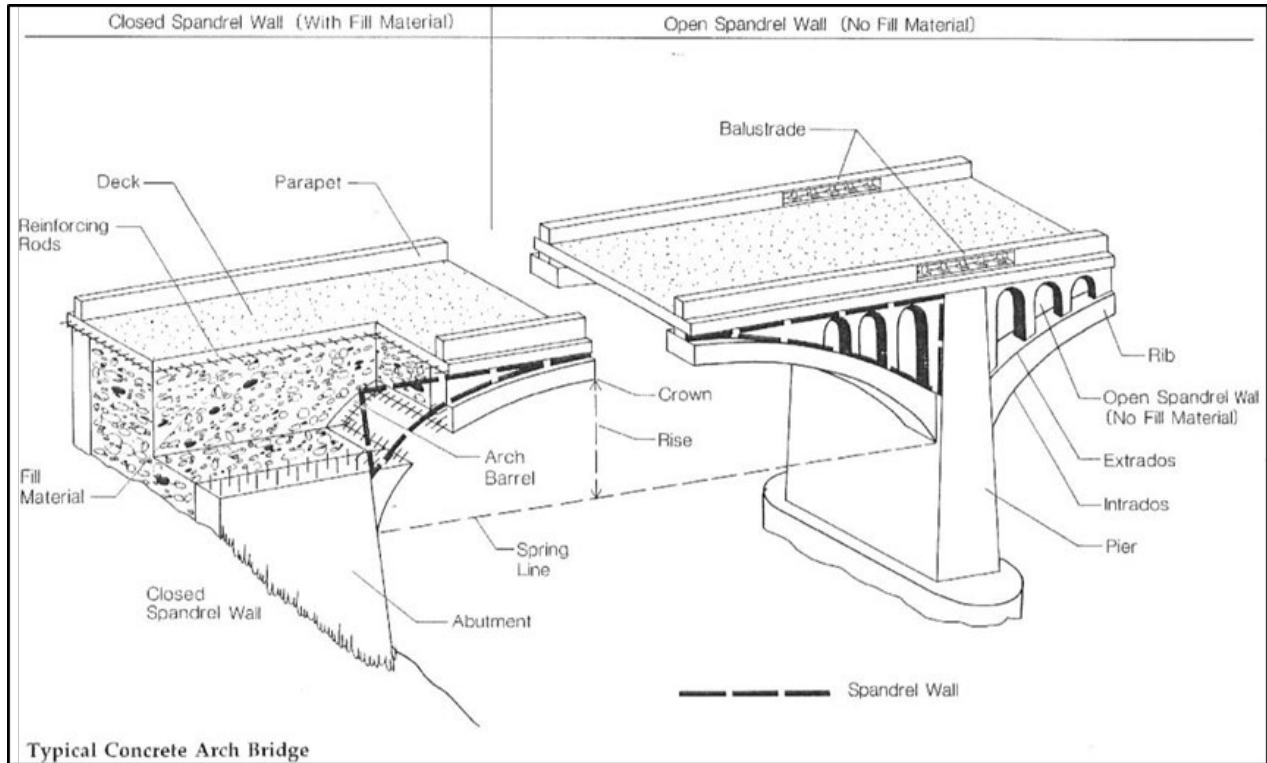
Elements of a Concrete Arch Bridge (PHMC and PennDOT 1986)
